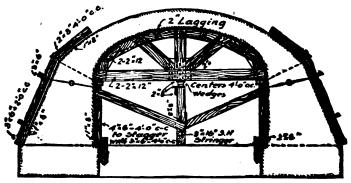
Cross-Section of Concrete Arch Culvert, Showing Forms.
